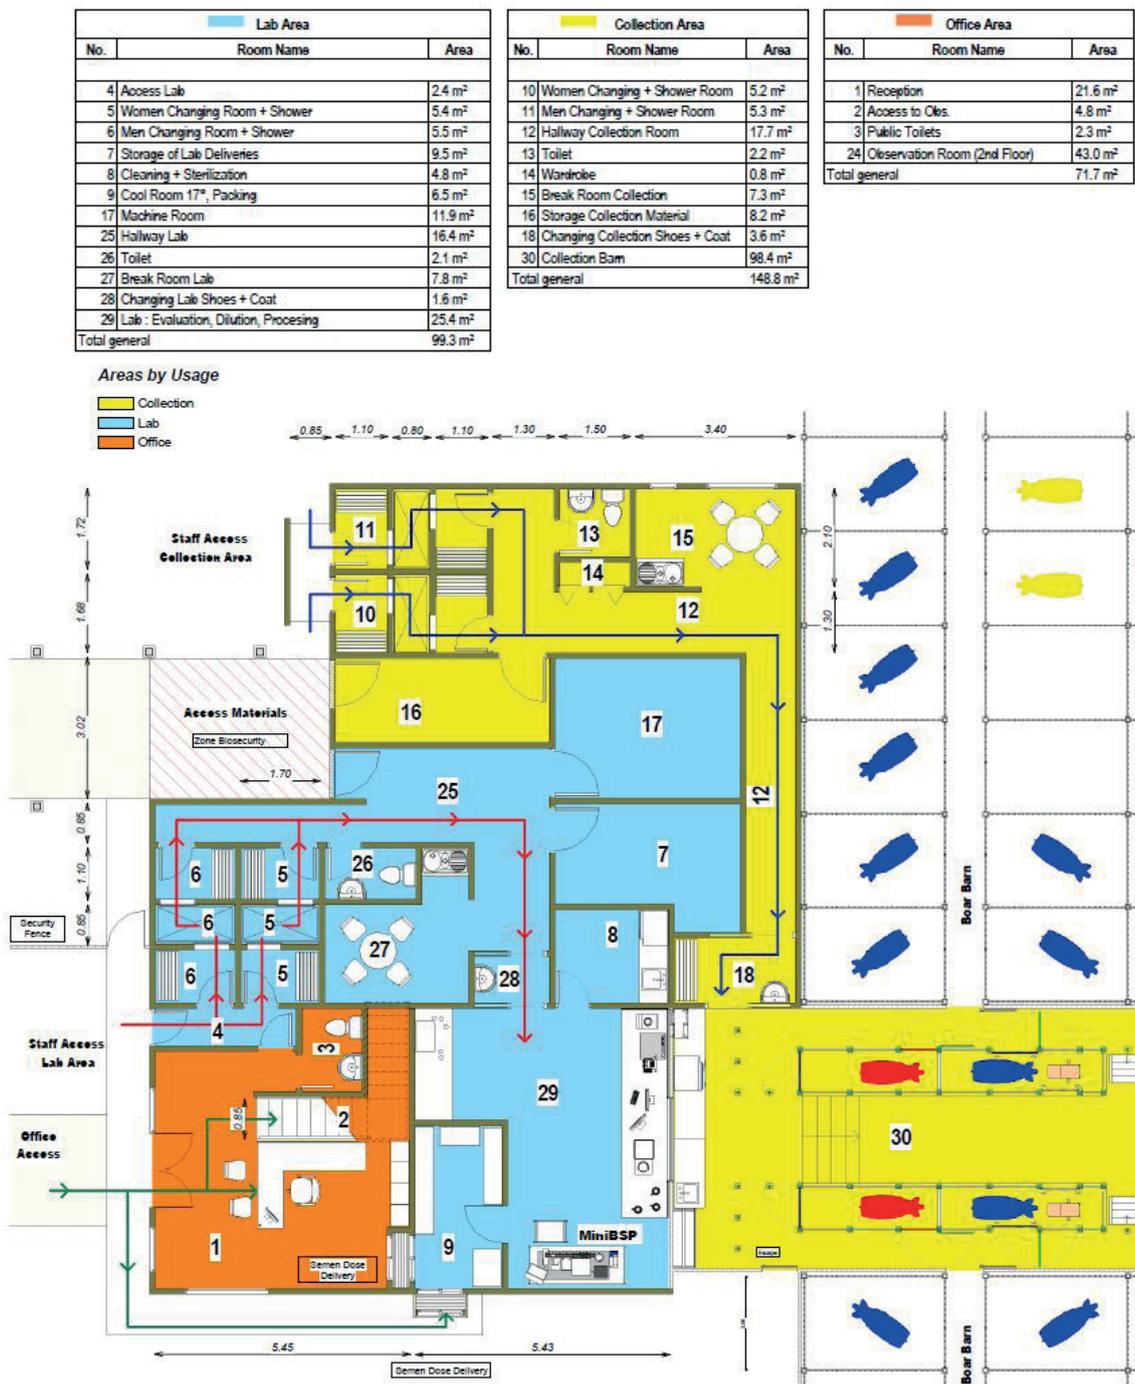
Building plan of laboratory, collection area and office area of a boar stud
